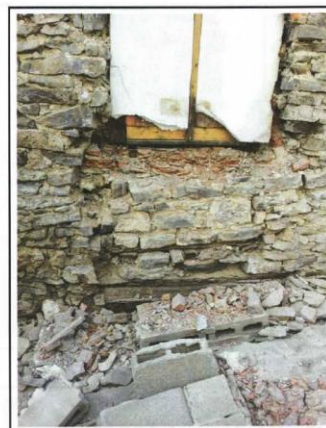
Deteriorated Masonry and Deteriorated Timber Embedded in Masonry Wall
